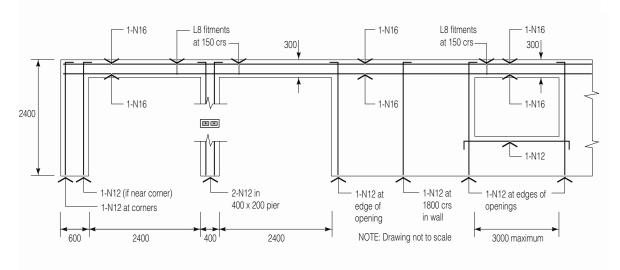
Wall Reinforcement for 190-mm Leaf for Wind Classifications N4 and C1 and 2400-mm Wall Height
